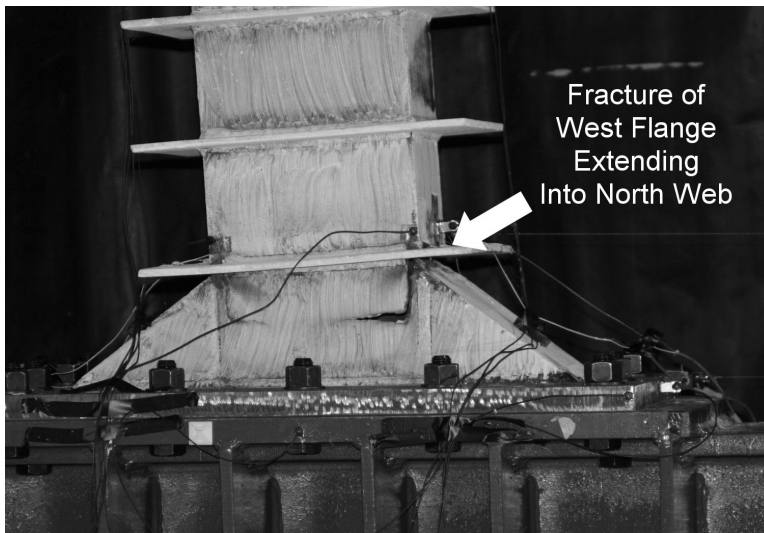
West Flange Fracture Extending into North Web of Specimen X2L2.1
